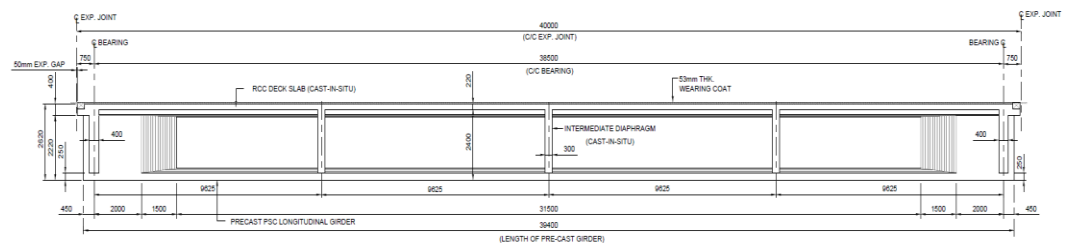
Elevation of 40m span OC post tensioned I girder
